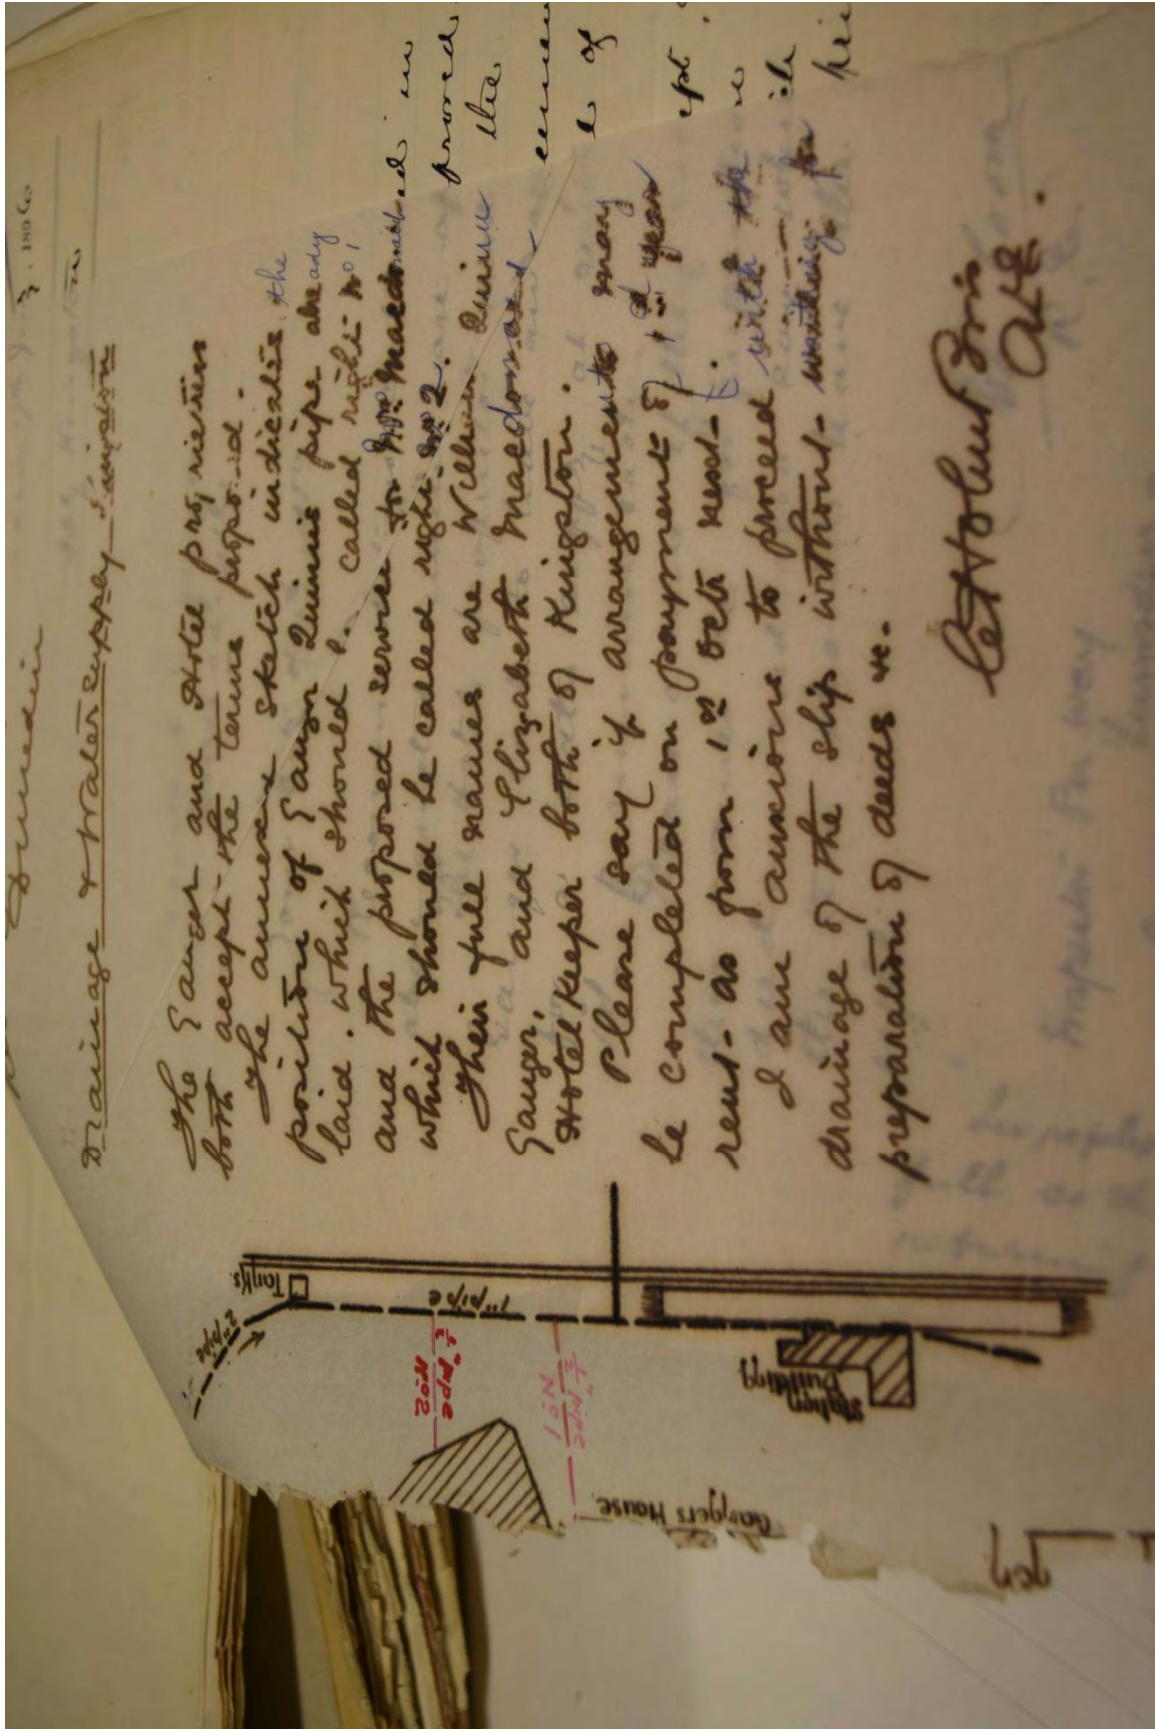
Railway correspondence dated 1896 regarding private rights to connect to the existing water supply to the station building.
